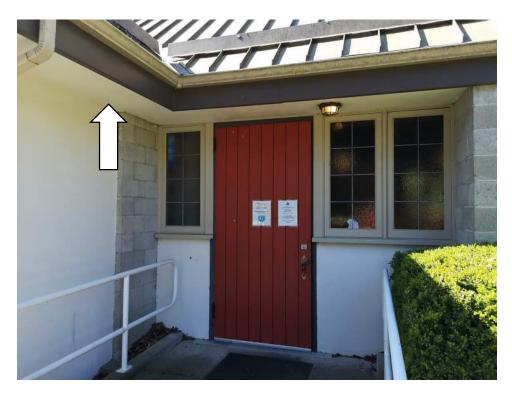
10 08.01 - Soffits - Repaint and Repair / Roof Overhangs / Original Church
